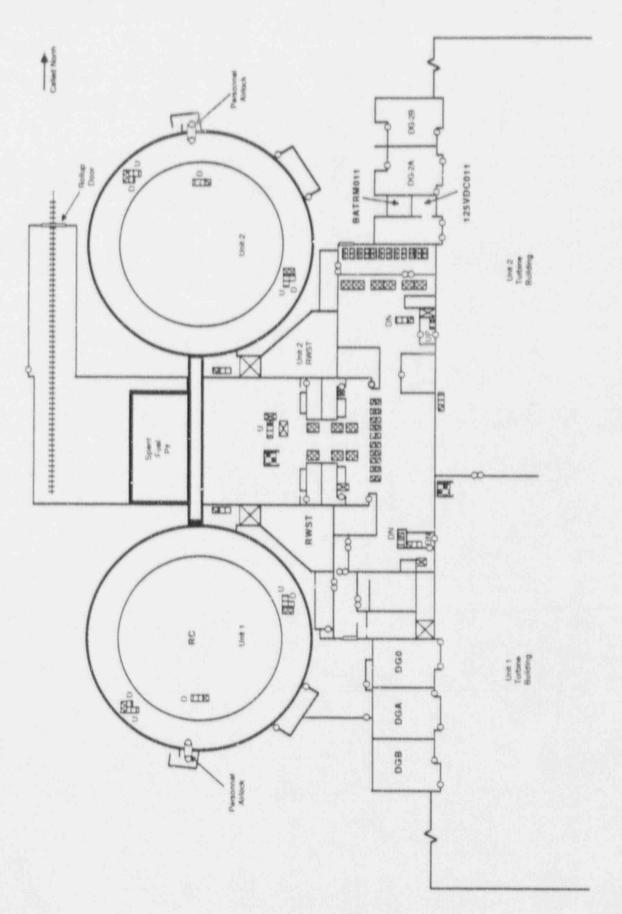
Zion 1 and 2 General Arrangement, Elevation 592"
